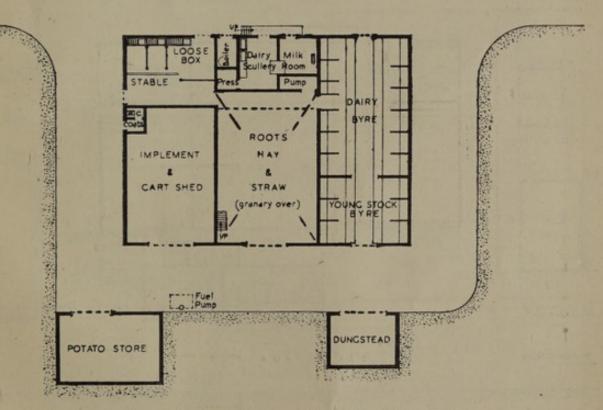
Plan M. Steading for Mixed Arable and Dairy Farm (Byre System) for 75 Acres
